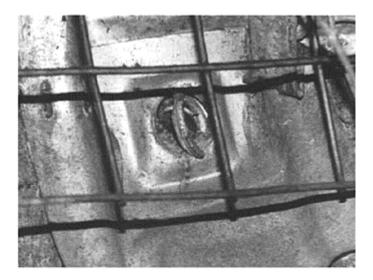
Damage of a reinforcing ring of the friction stabiliser due to wrong installation technique.
